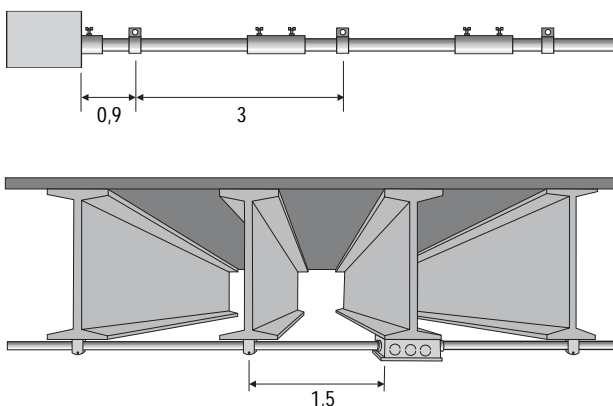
Secure fixing of EMT conduit. Max 3 m between fixing points and max 0,9 m from box, top picture. Bottom picture shows an example of an allowed exception, where the conduit can not be fixed 0,9 m from box. In this case 1,5 m is allowed if a full length conduit is used.
